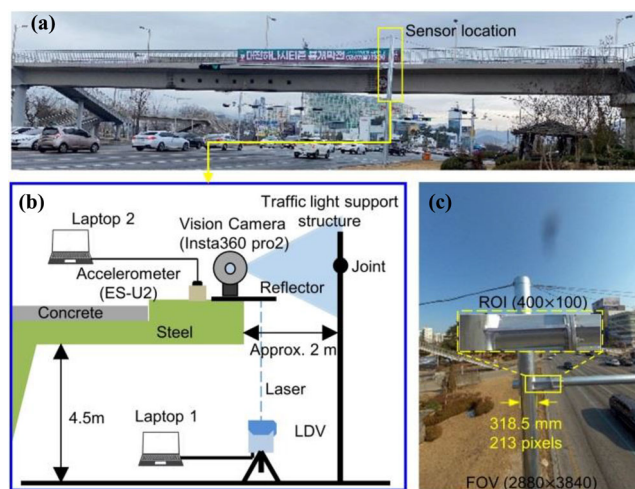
Overview of the pedestrian steel box girder bridge test: (a) pedestrian steel box girder bridge, (b) experimental setup, and (c) FOV of vision camera and initial ROI
